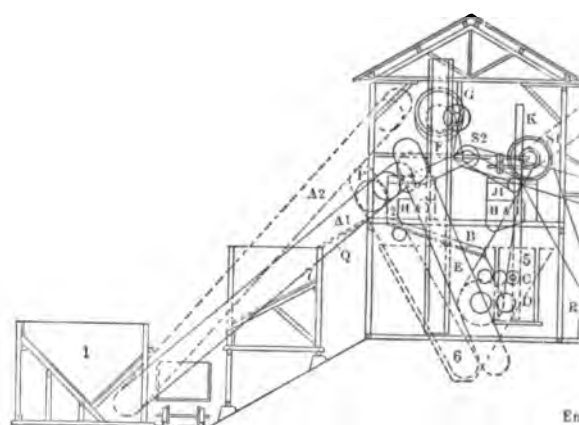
PLAN OF STEIN AND BOERICKE WASHERY.
